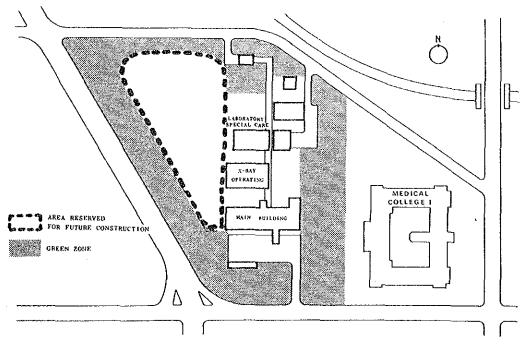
PLAN OF FUTURE DEVELOPMET AREA
